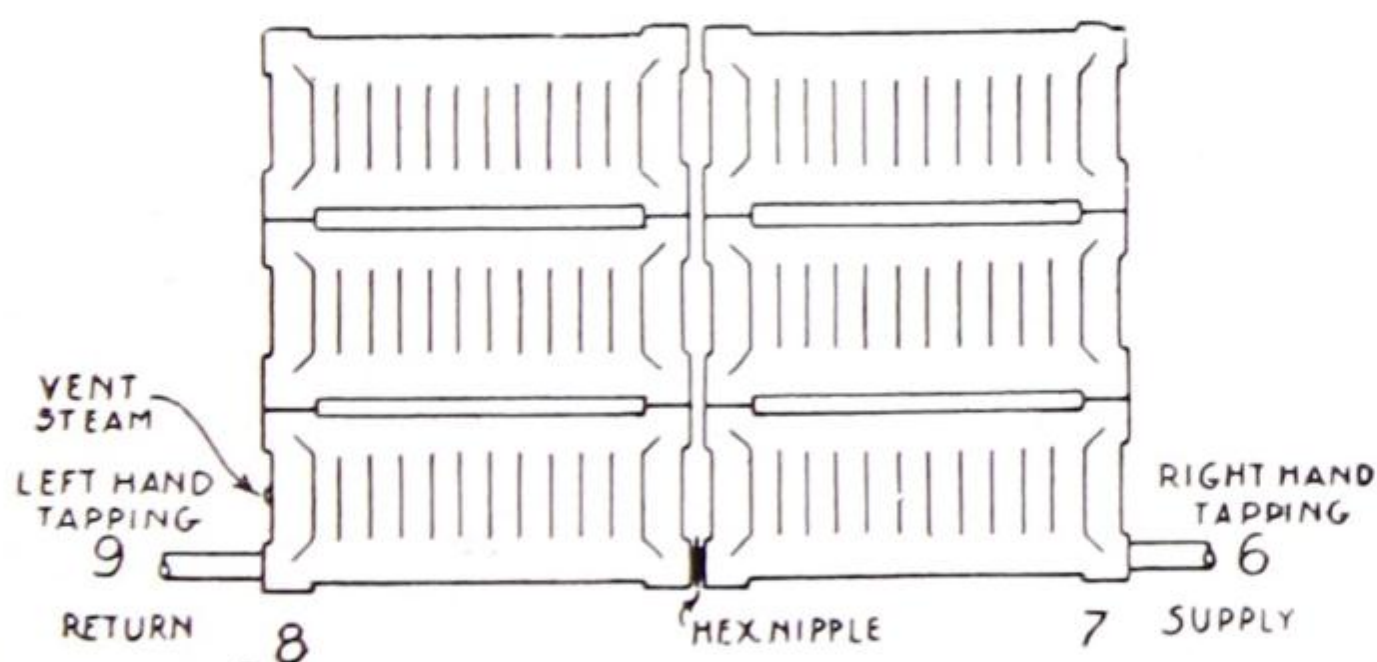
Assembled Six Sections in Three Tiers—One- and Two-Pipe Steam
